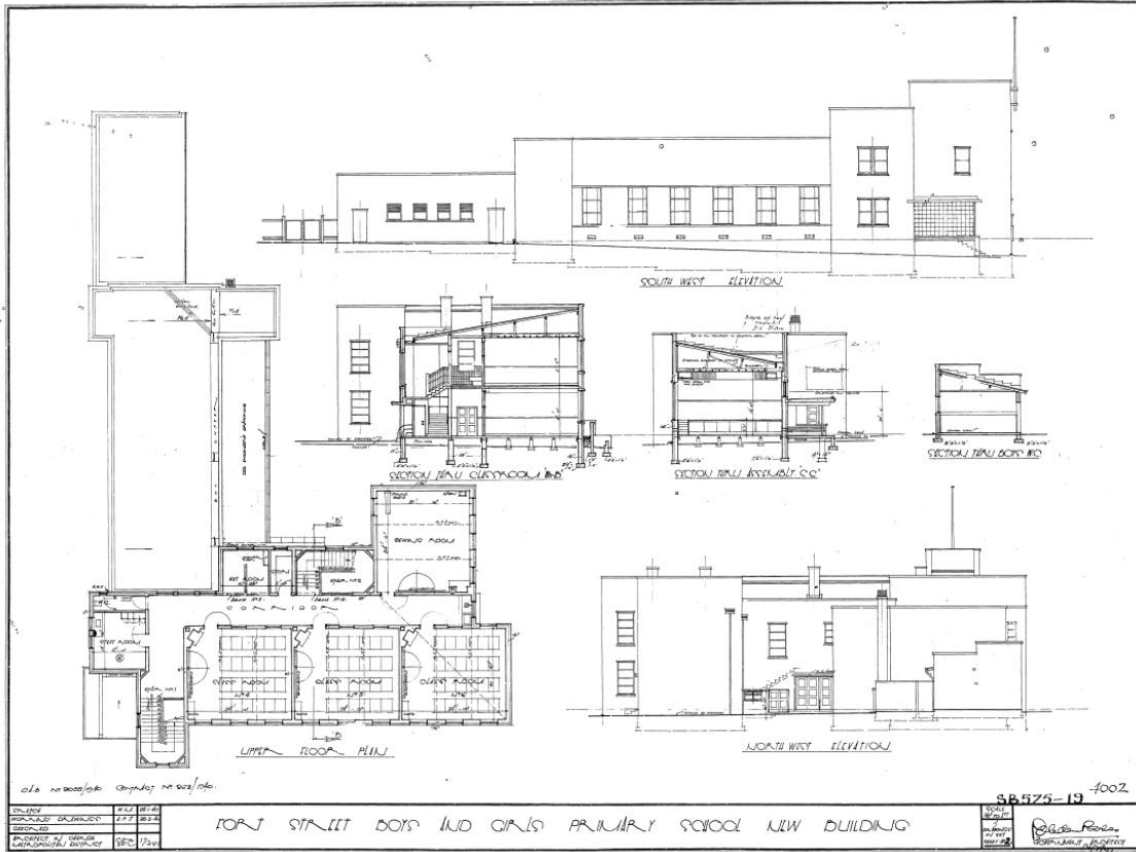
Drawing prepared in the Government Architect's office describing the first floor plan, south west and north west elevations, and cross sections through the building. (Source: Finance & Services Information Services, drawing SB575-19.)
